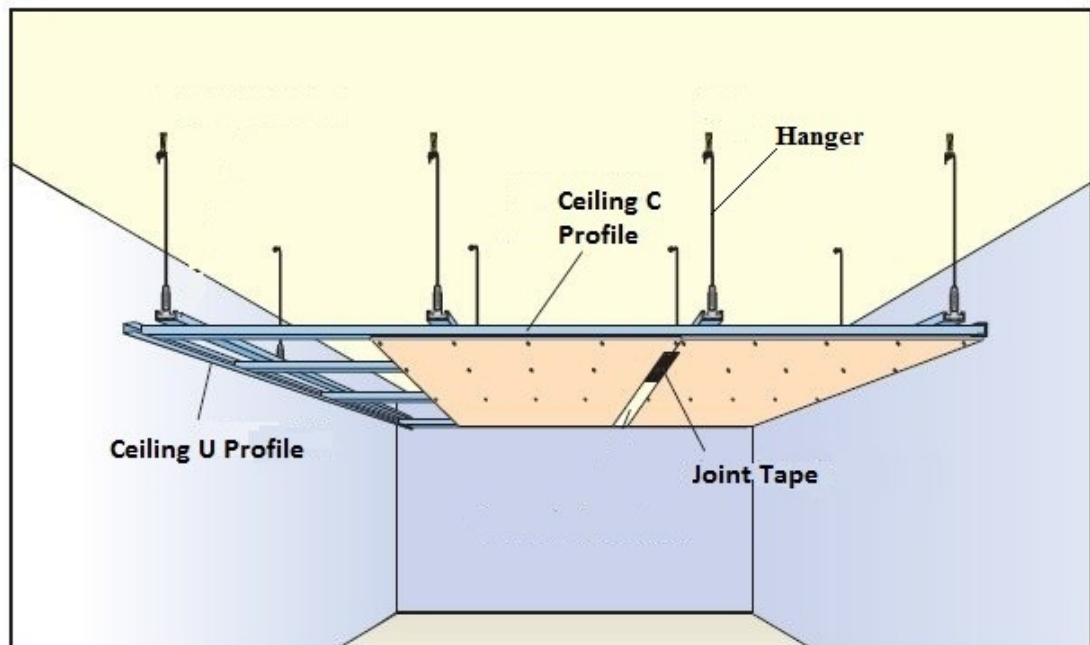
Application of Ceiling U, Ceiling C and Sheet Rocks
